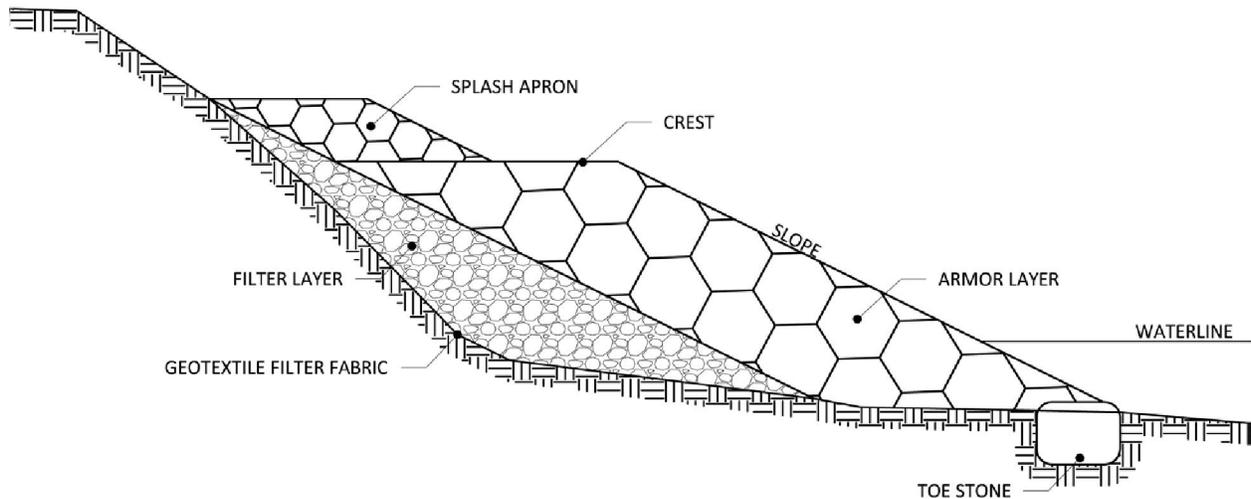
Typical Revetment Section (Source: ODNR OCDM)
